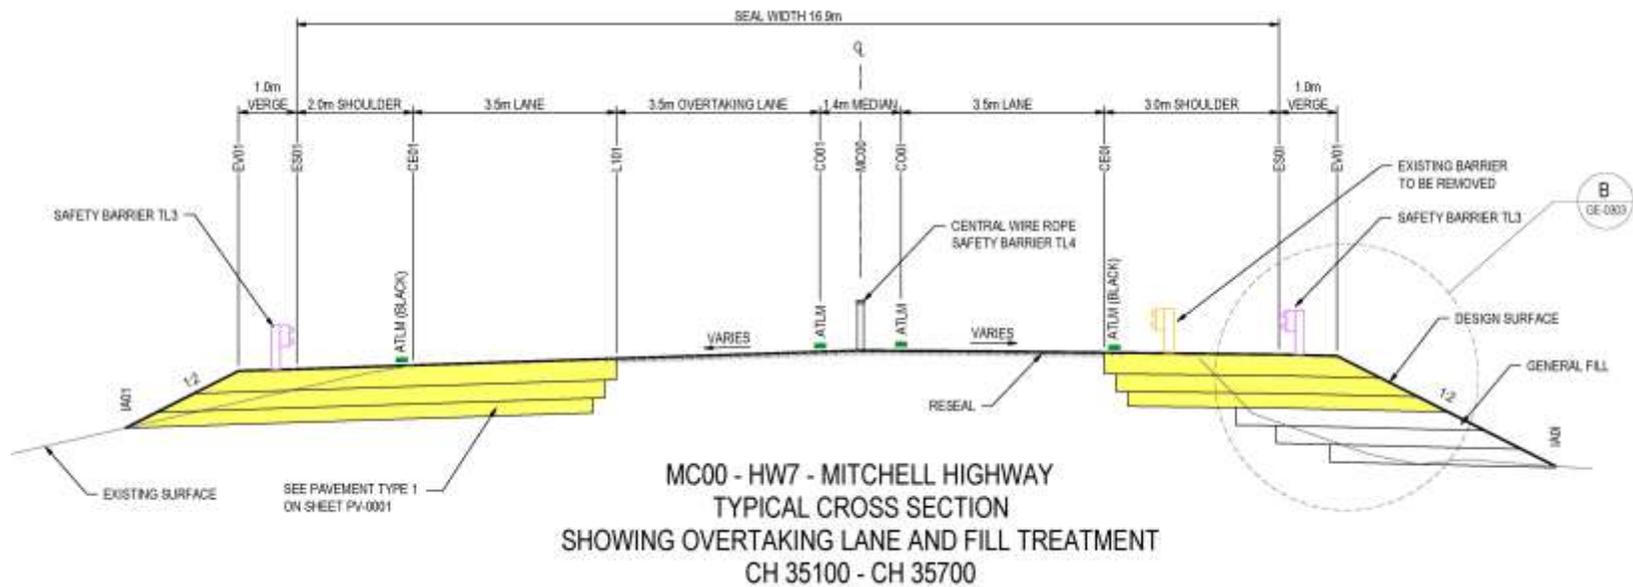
Typical cross section – overtaking lane and fill treatment
